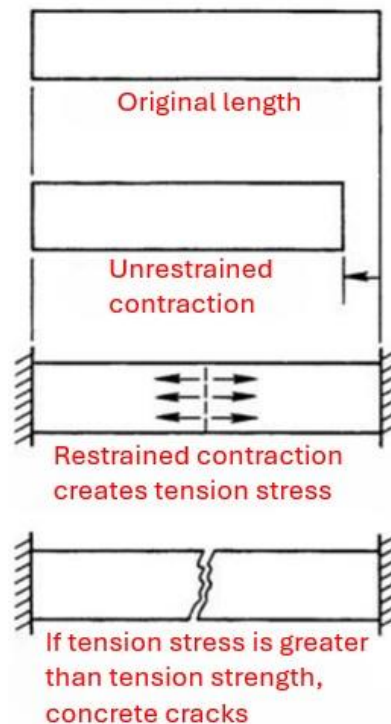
Sketch of concrete slab thermal contraction cracking [79].
